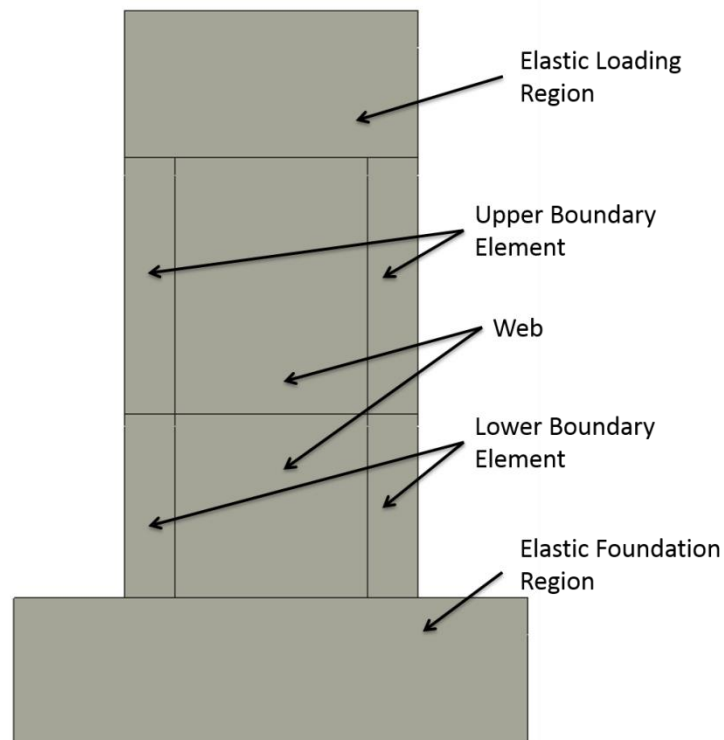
Geometric Layout of ATENA Model (Specimen RW-A20-P10-S63)
